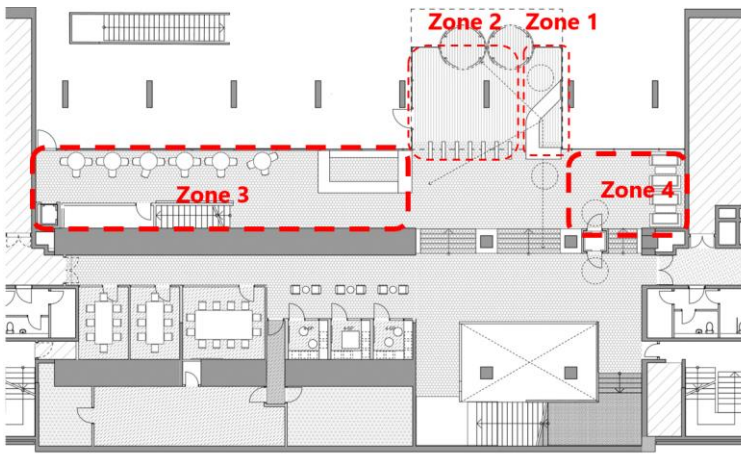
2 assessed zones based on new architectural layout and arrangement for level 3
